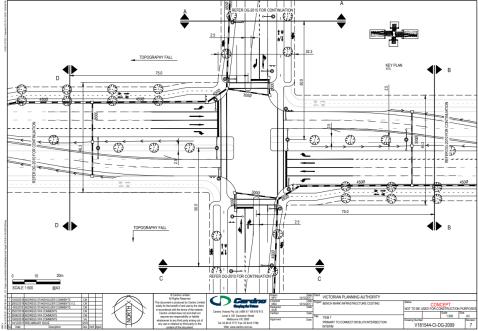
Primary Arterial to Secondary Arterial Benchmark Intersection Layout
